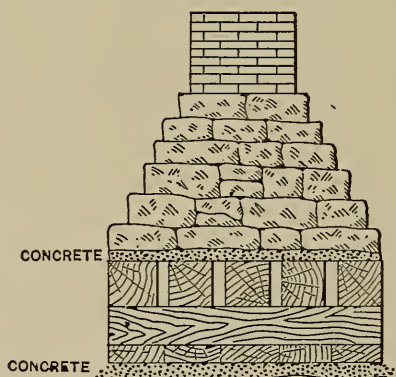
Timber and Concrete Support for Foundation Wall.
